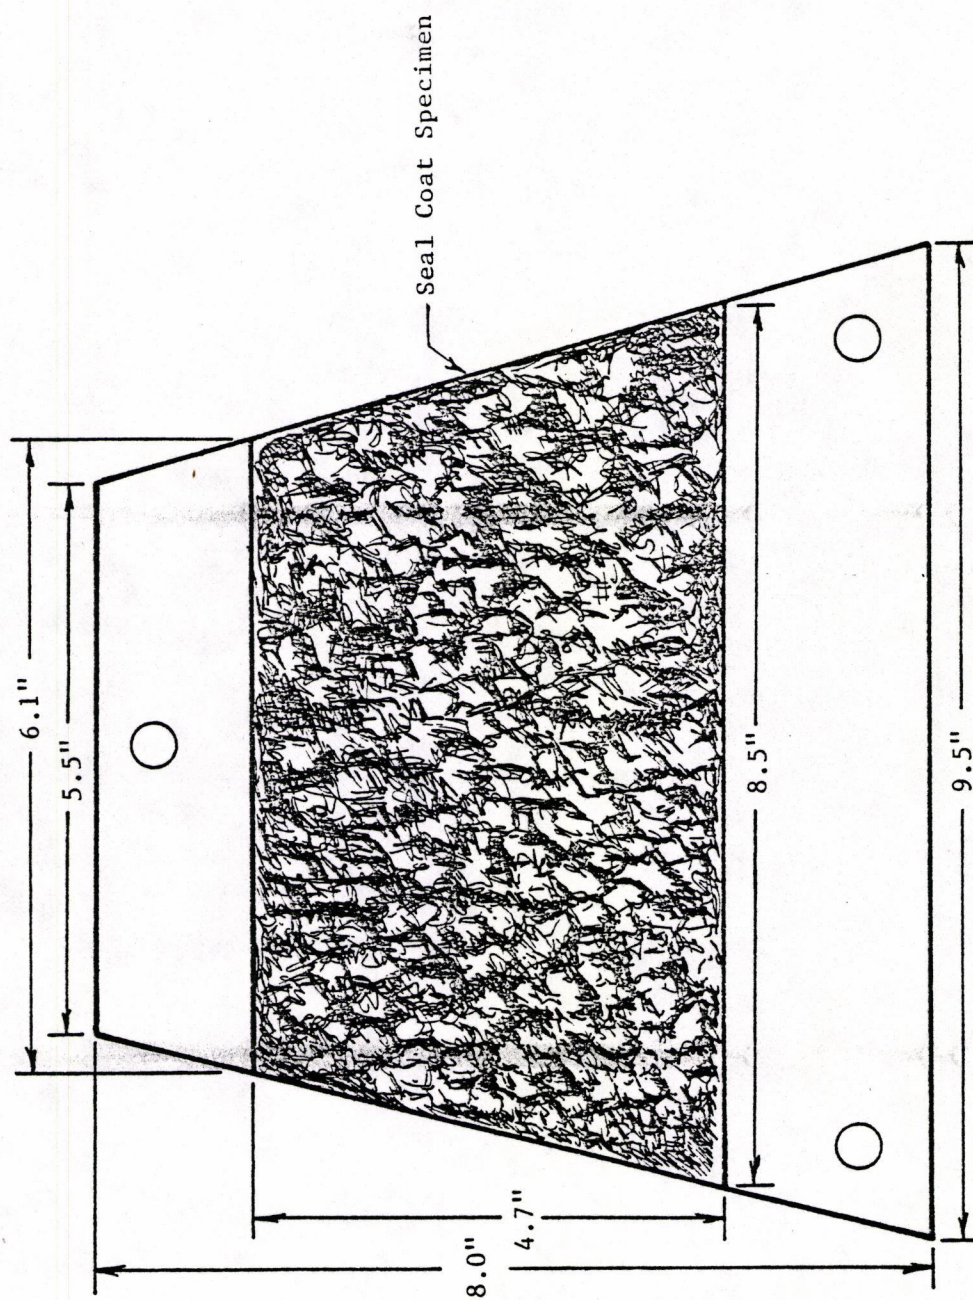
Accelerated Wear Device Seal Coat Specimen Plate
